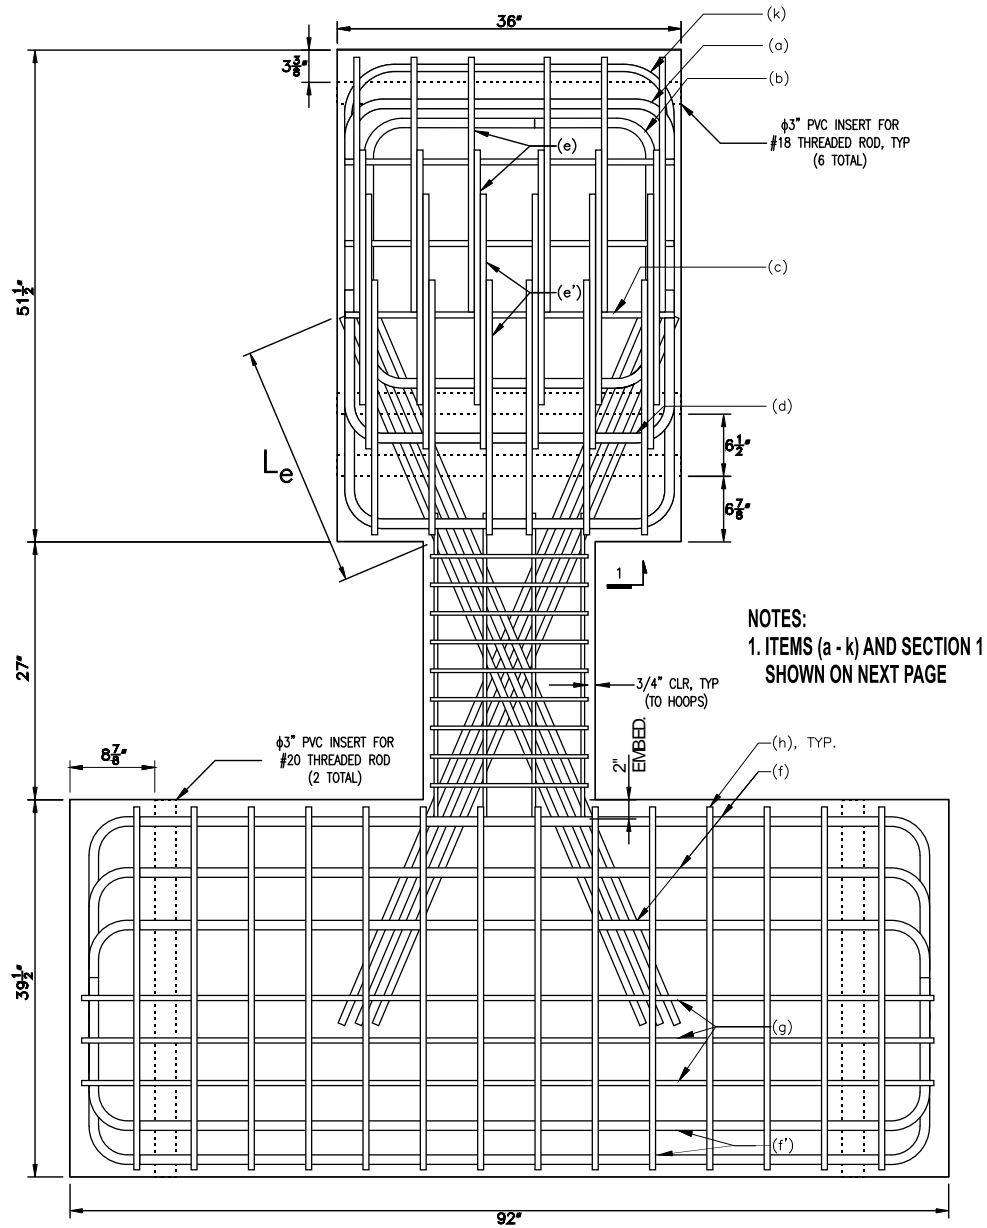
Elevation view of D100-1.5 (1 in. = 25.4 mm)
